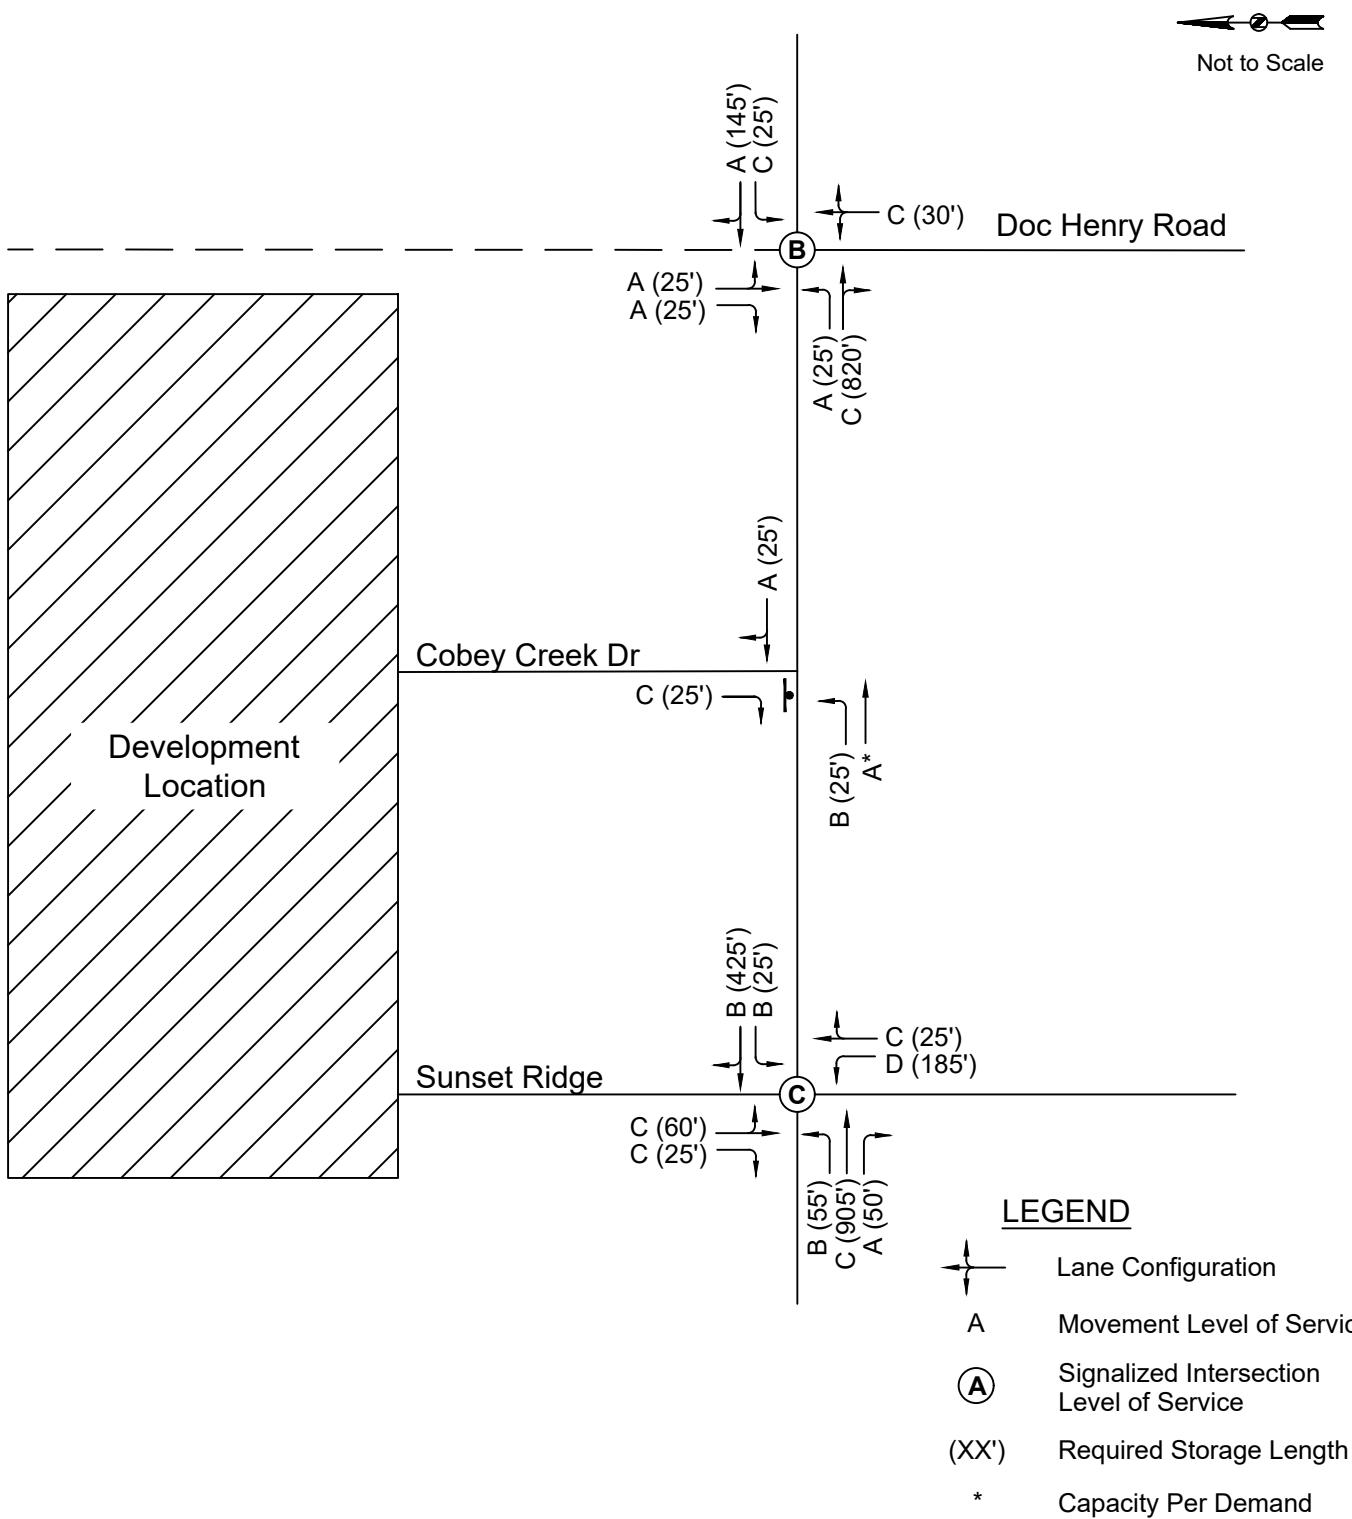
Existing plus Site and Ovations Site PM Level of Service
